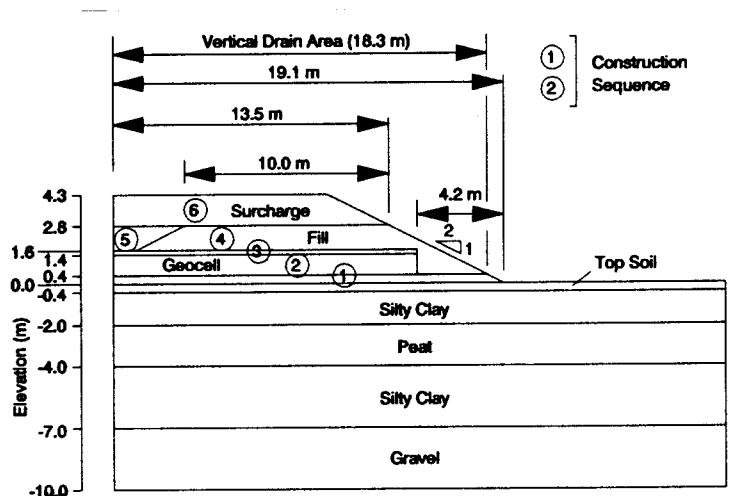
The structure of Dartford road embankment and its construction sequence at Sta. 1550
